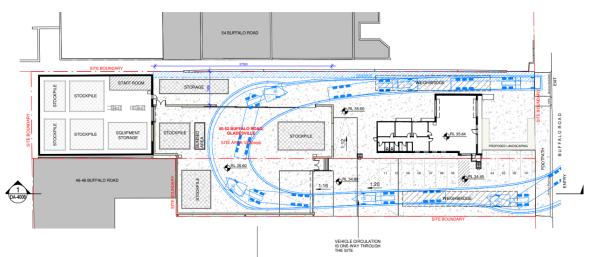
Plan showing footprint of buildings and swept path of semi-trailer accessing the site.
